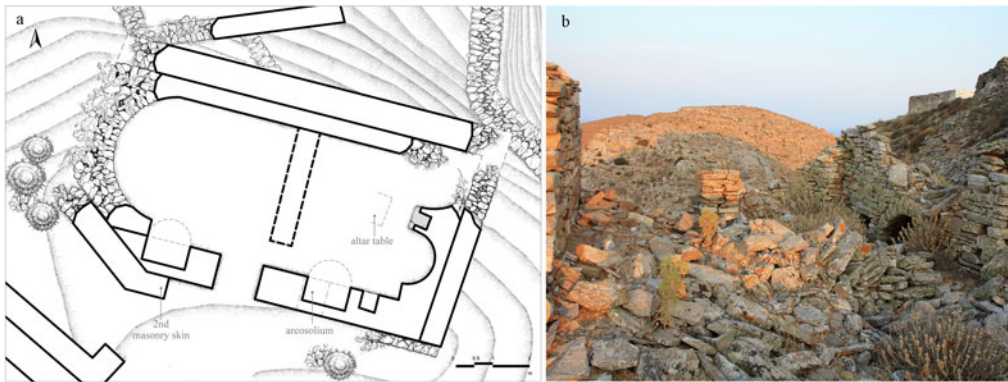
Ch 6 (a) floor plan, masonry construction joints indicate different construction phases (b) the interior looking east, apses separated by small wall section bearing a niche.
